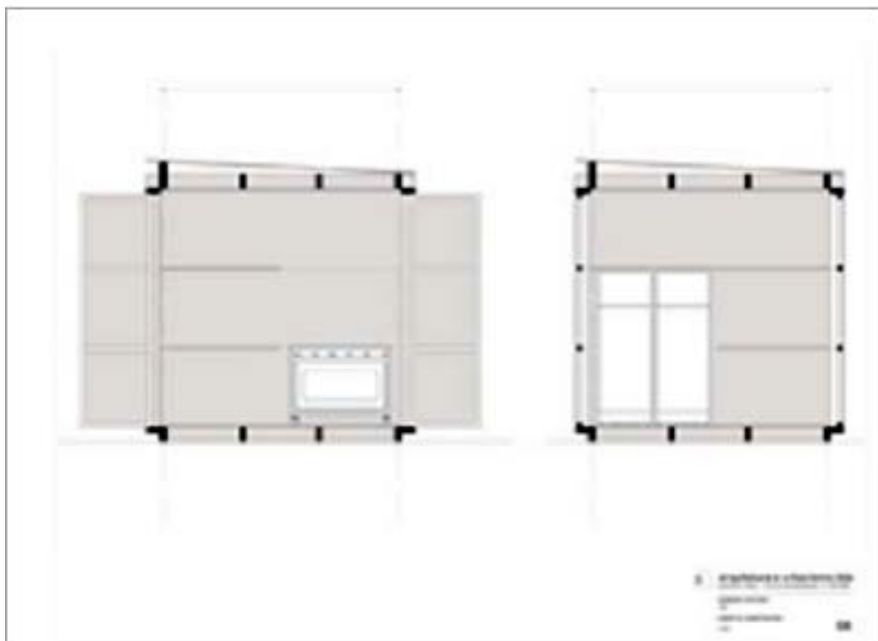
Architectural Drawing, Plan and Elevation. Sources: Mike O'Kelly's file.
